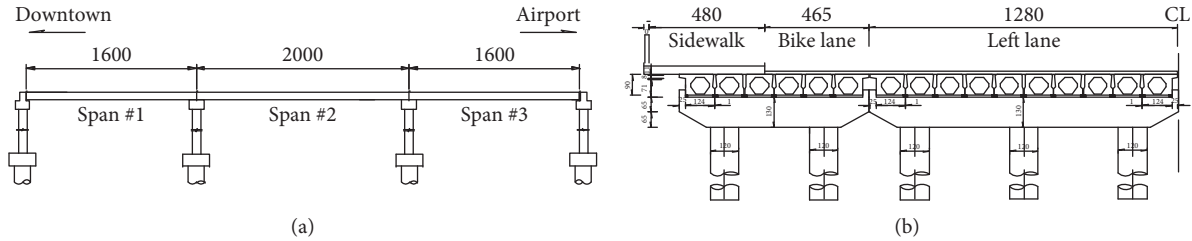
Schematic of Beida Bridge (unit: cm). (a) Elevation. (b) Half cross section (left) of the bridge.
